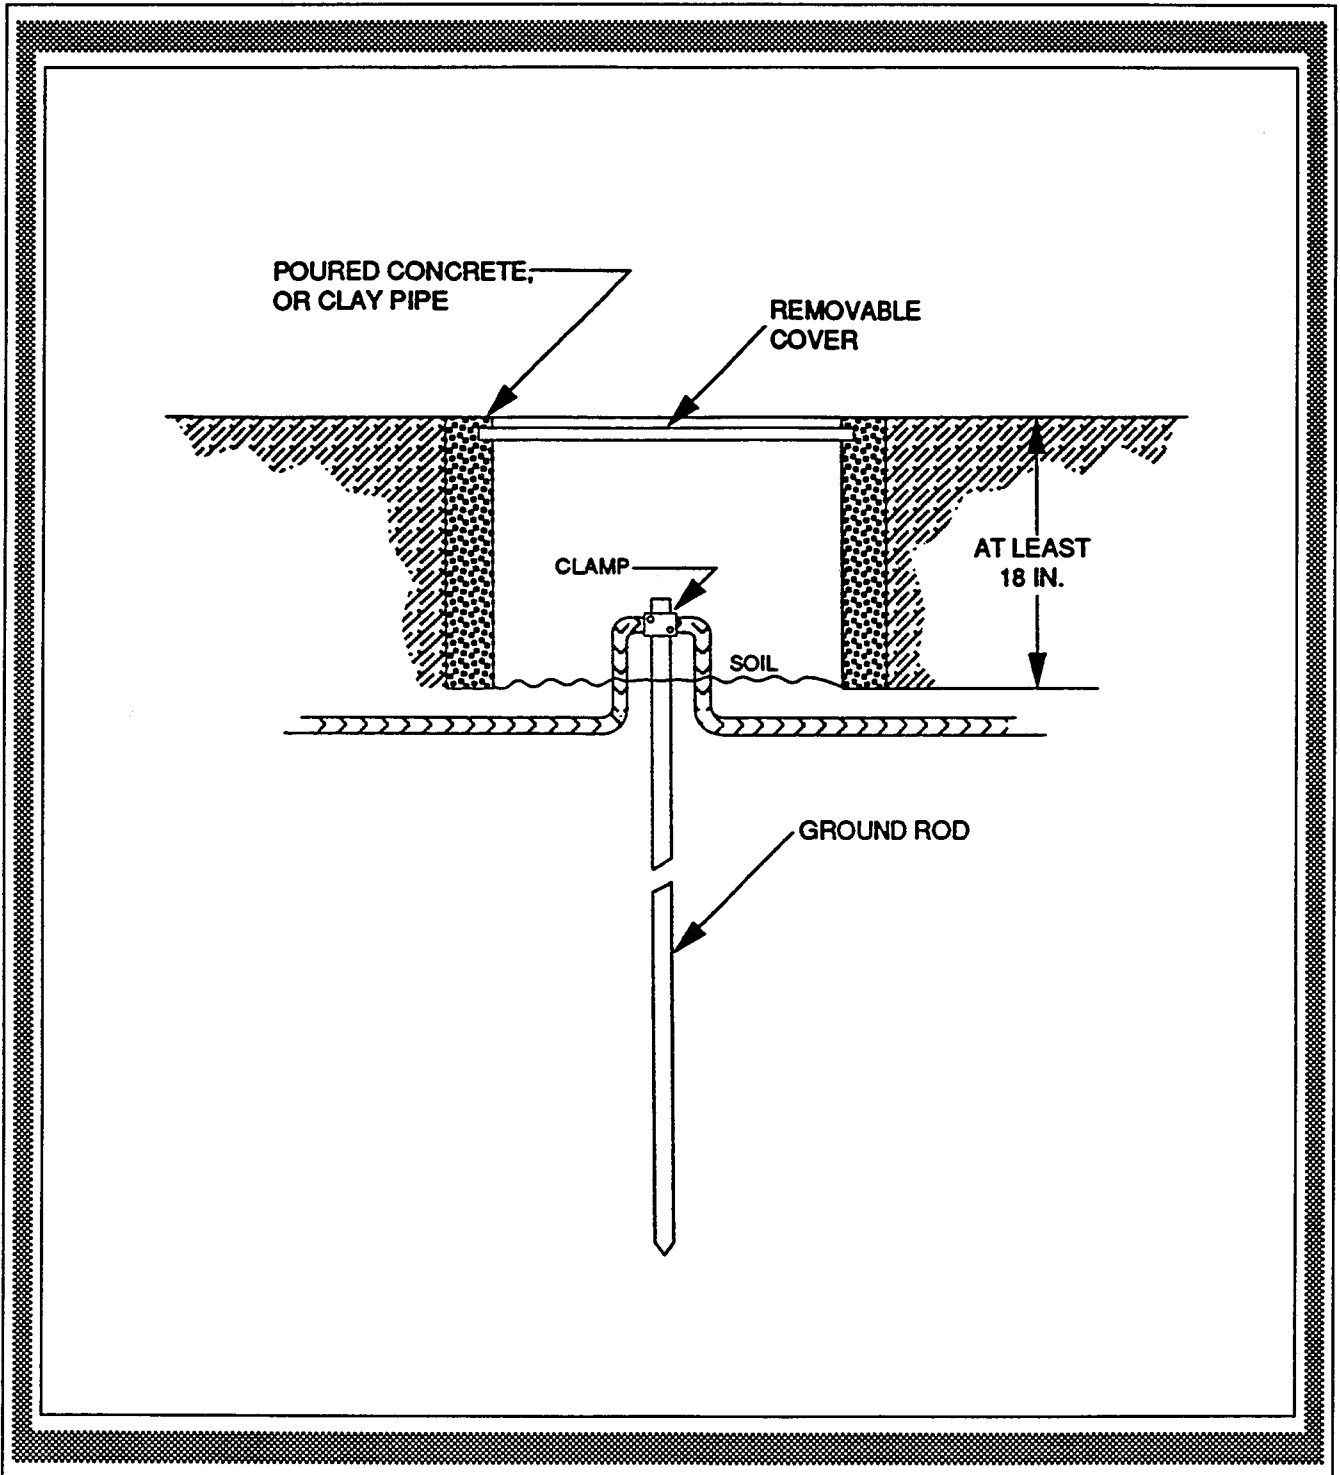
DETAILS OF GROUND ROD/INTERCONNECTING CABLE INSTALLATION
